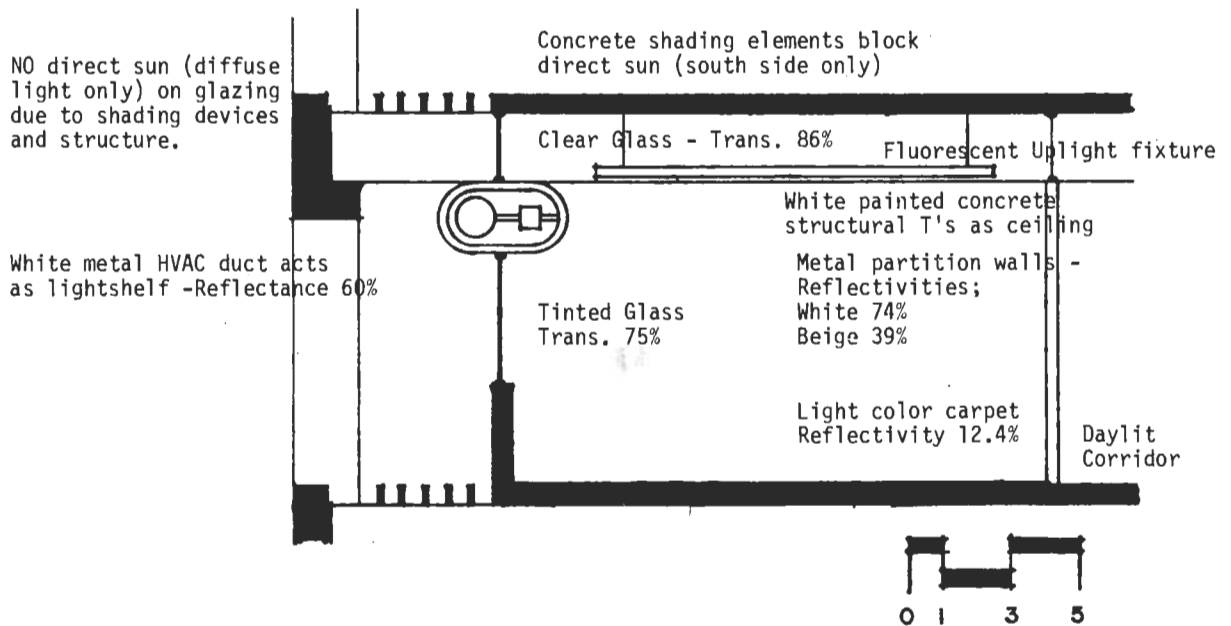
ROOM SECTION @ SHELL WOODCREEK / HOUSTON
